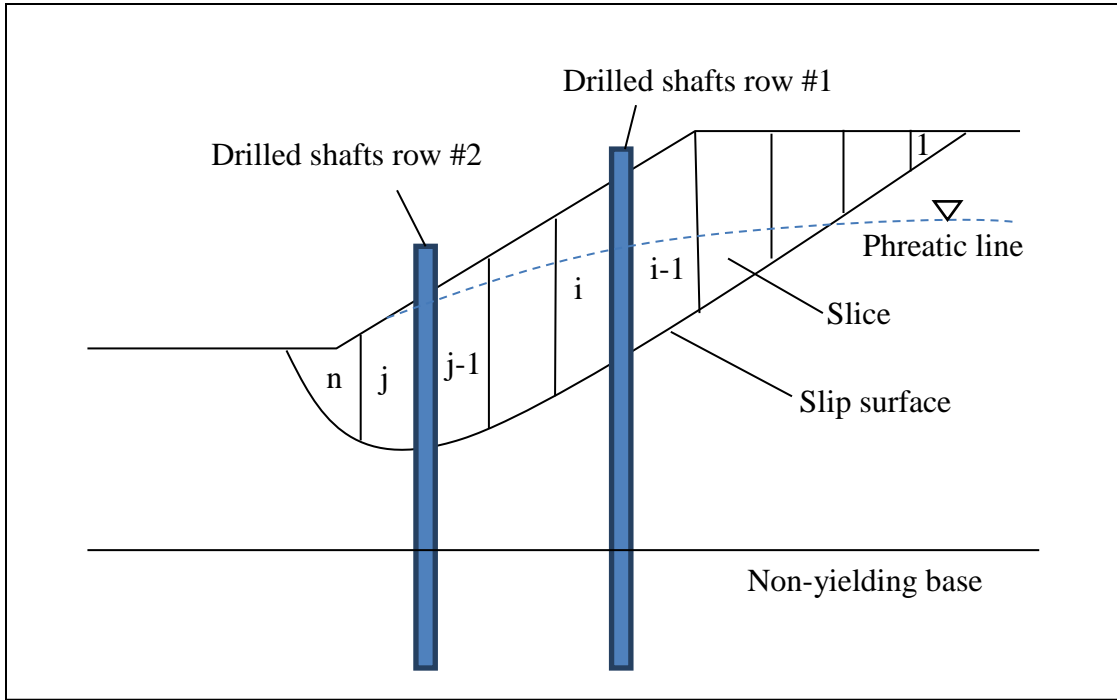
A typical cross-section divided into slices for a slope reinforced with two rows of drilled shafts
